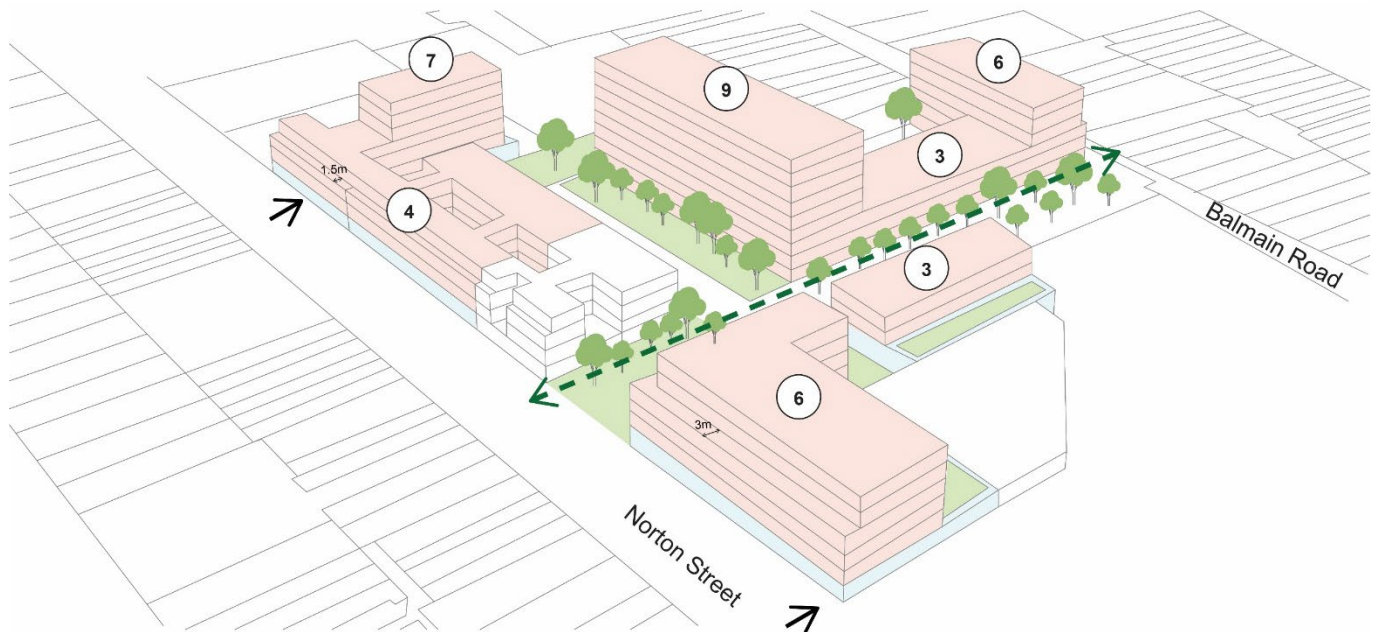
Norton Street Opportunity Site - axonometric view from Balmain Road
